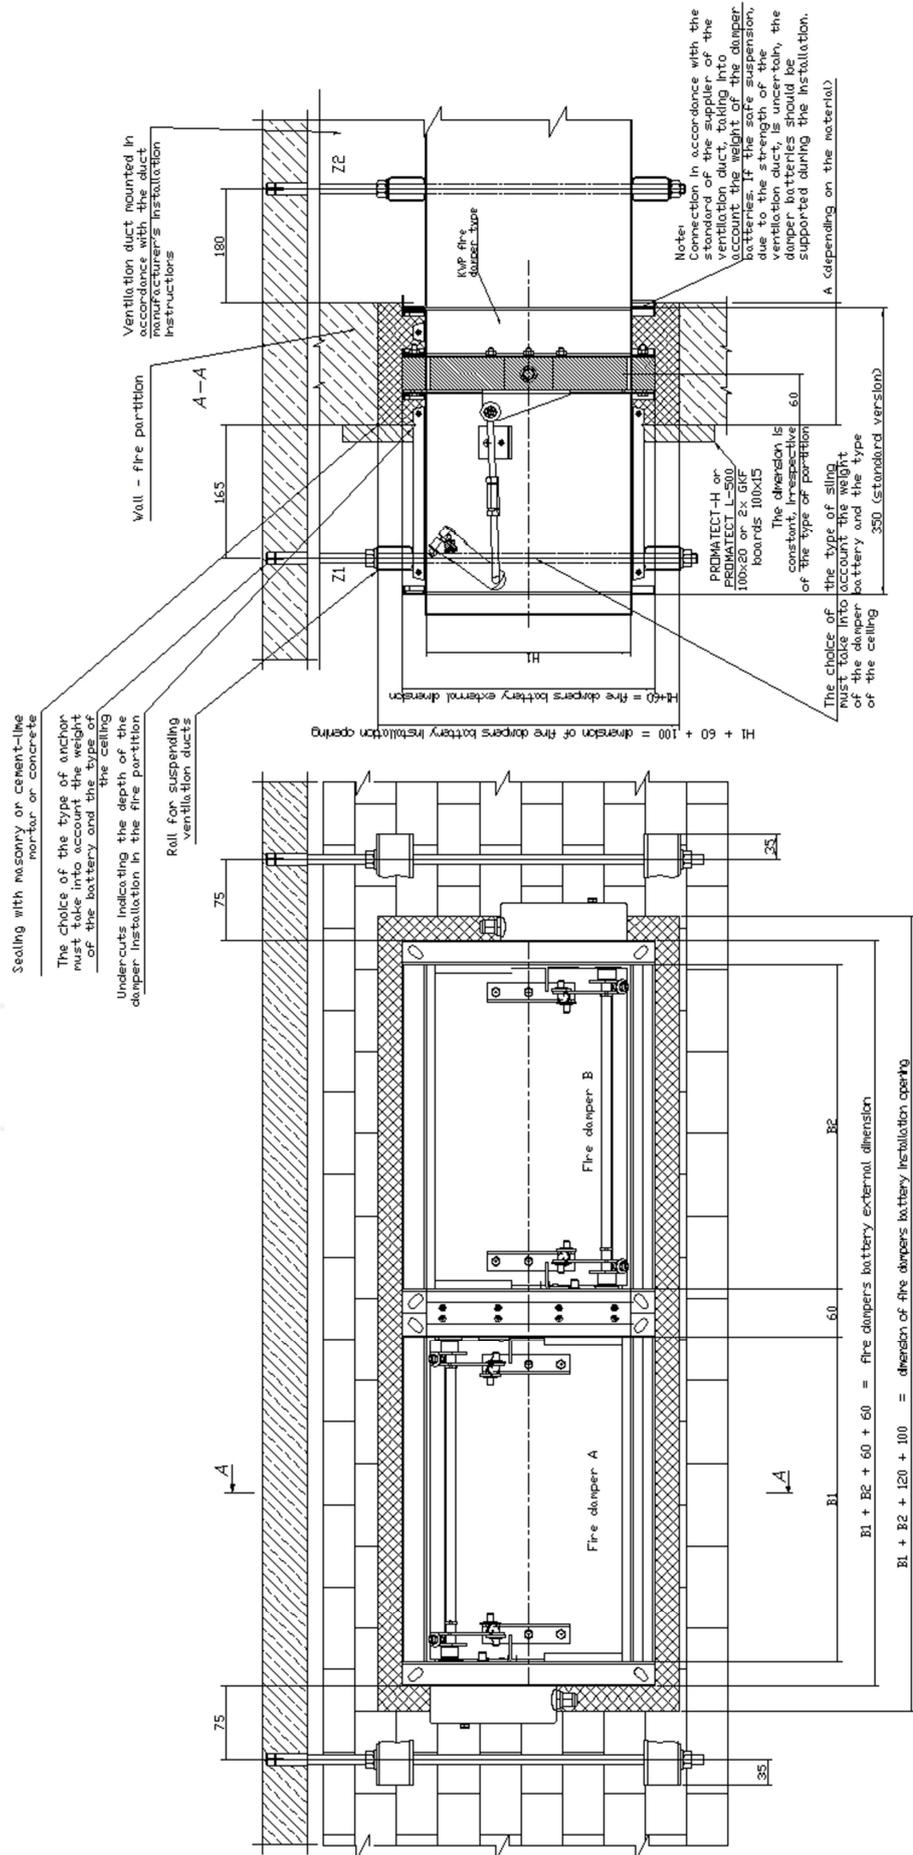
Installation of battery consisting of two fire dampers KWP in horizontal arrangement in wall
